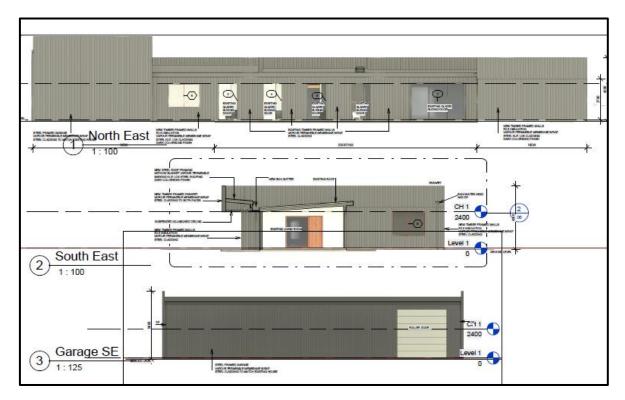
Principal dwelling additions elevations (Plan 1A)
